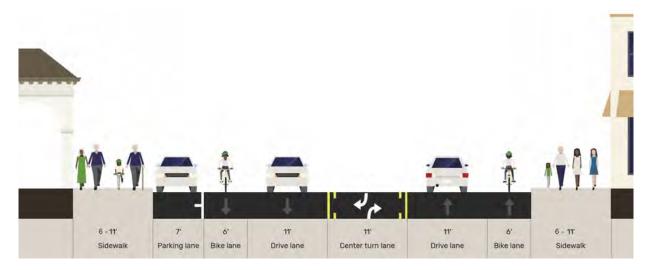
NE 3rd Street: Standard Bike Lanes and Sidewalk Infill Concept
